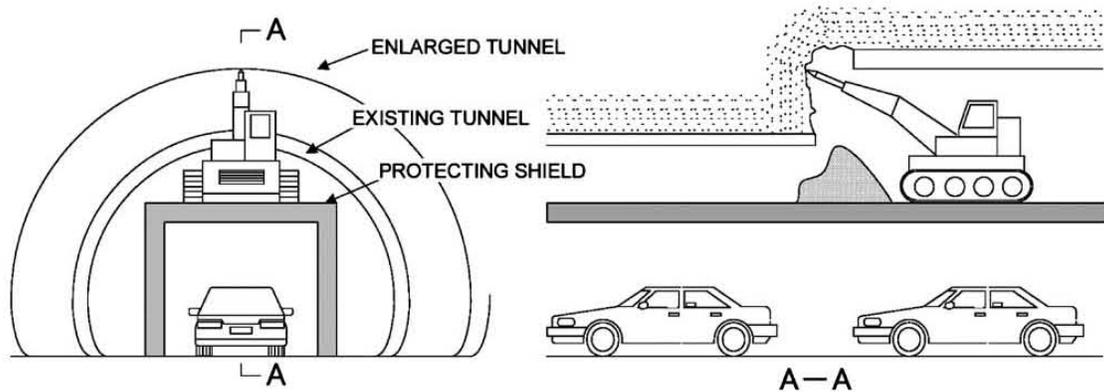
Typical Tunnel Enlargement Layout (Tonon 2010)
